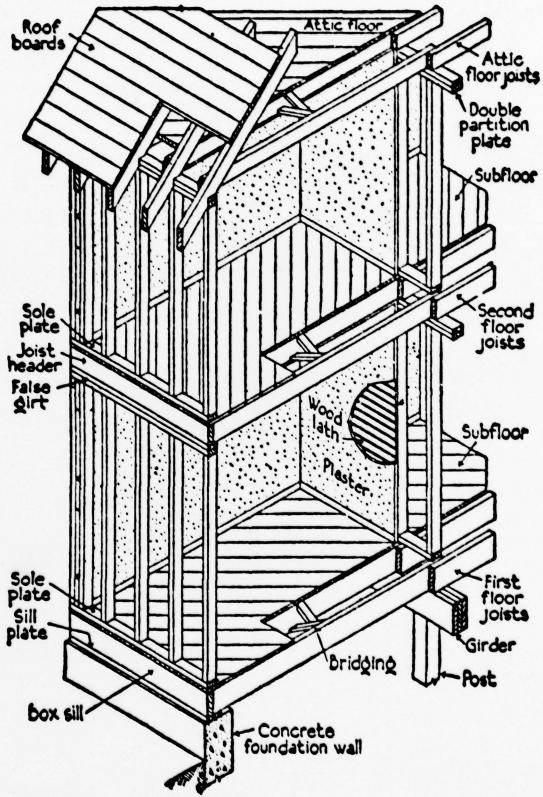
PLATFORM FRAME CONSTRUCTION 14
